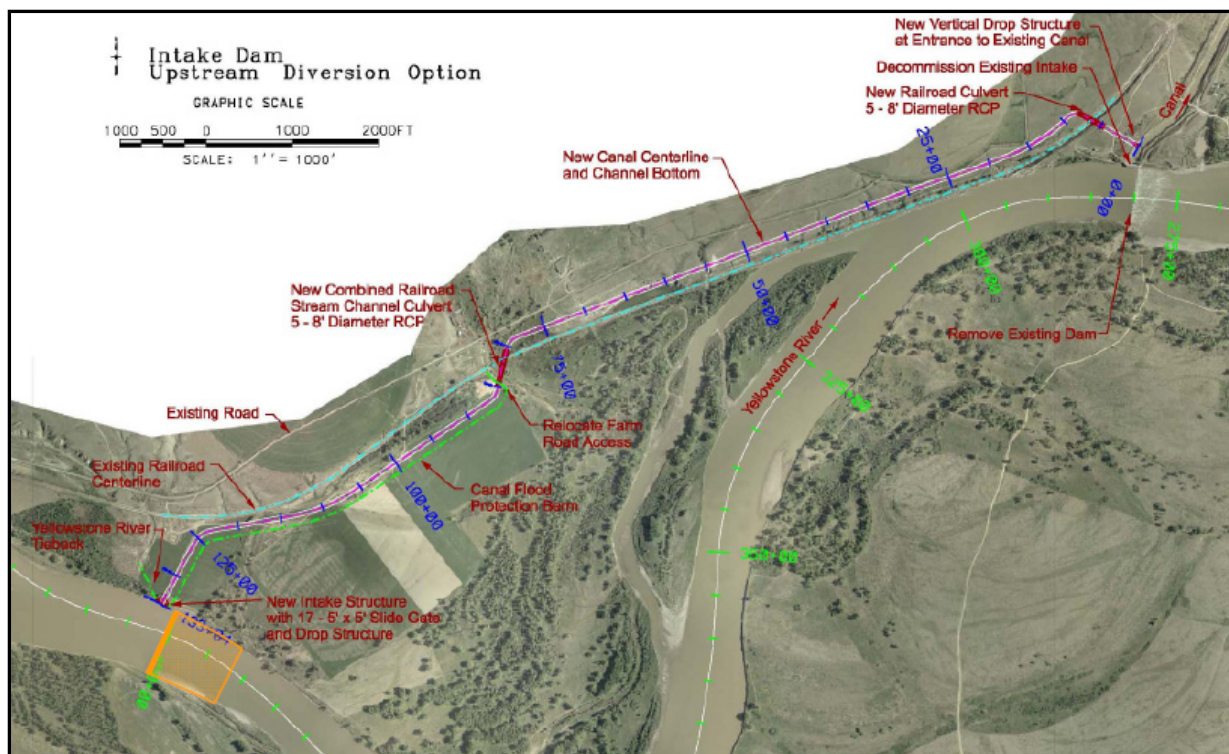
Relocate Diversion Upstream Alternative With Rock Ramp.
